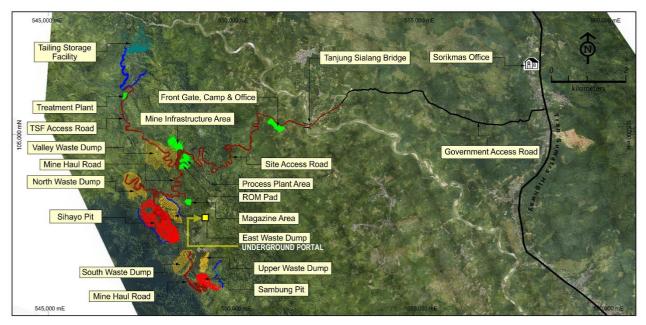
Sihayo 2022 FSU open-pit development layout plan
